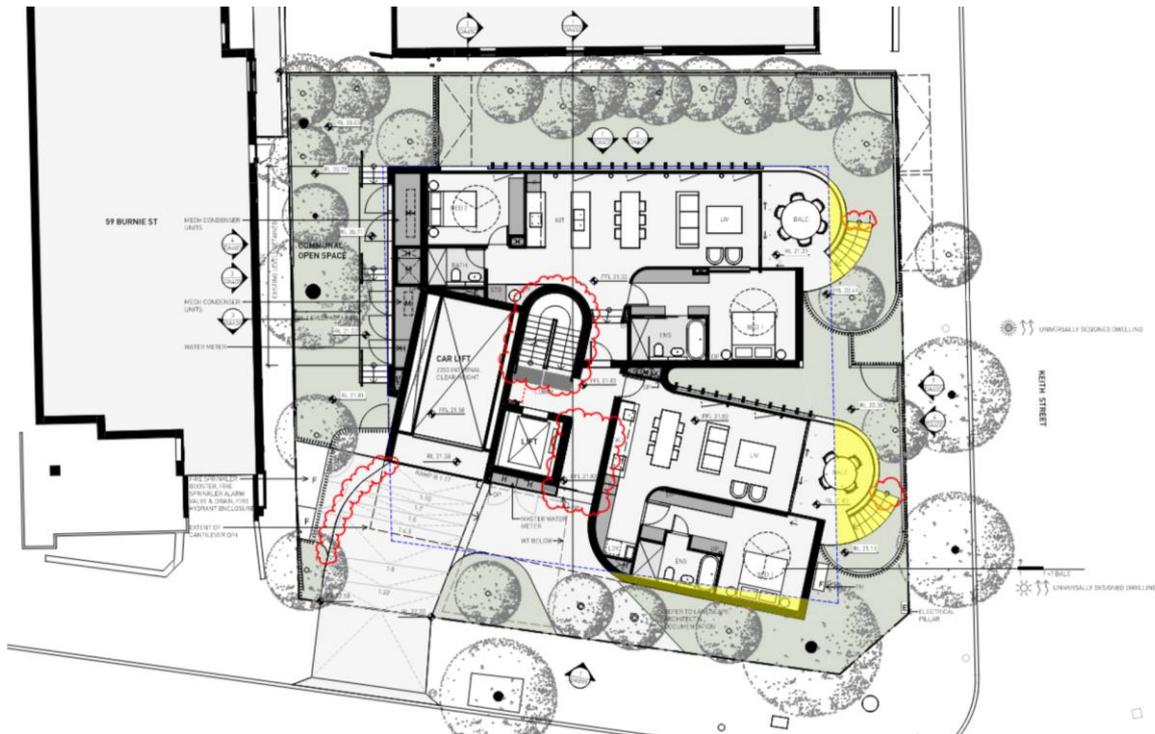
Markup of proposed ground floor plan (Source: Smart Design Studio with Council officer markup)
